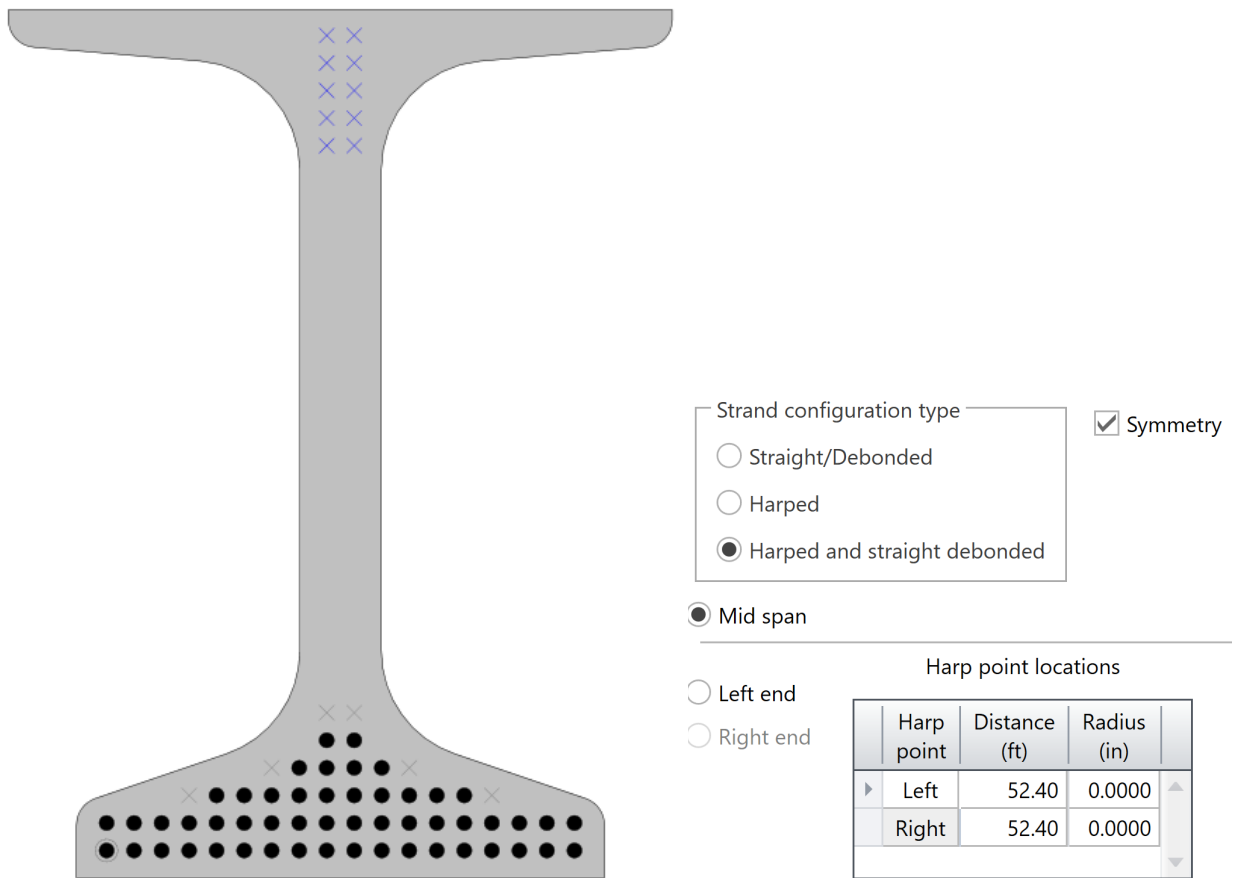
Bridge Girder Details for S080 41653 (AASHTOWare™ BrR, 2023)
